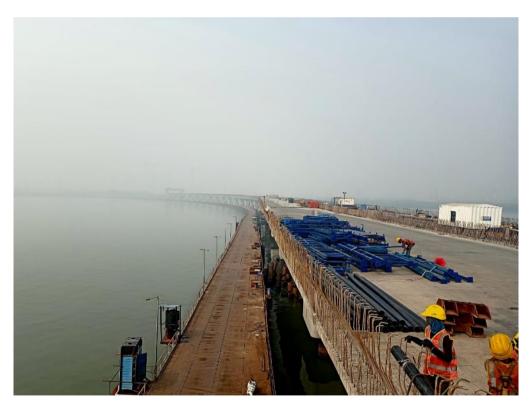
A view of the Erected Spans at the Intertidal area (MP 40 to MP-05) looking towards Navi Mumbai
